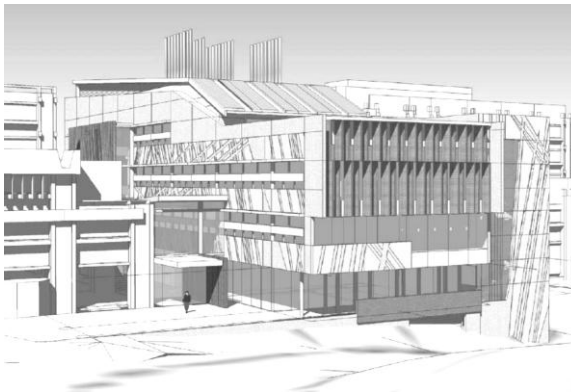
First multi-storey PRESSS-Building in New Zealand (Structural Engineers: Dunning Thornton Consultants; Cattanach and Pampanin, 2008).
